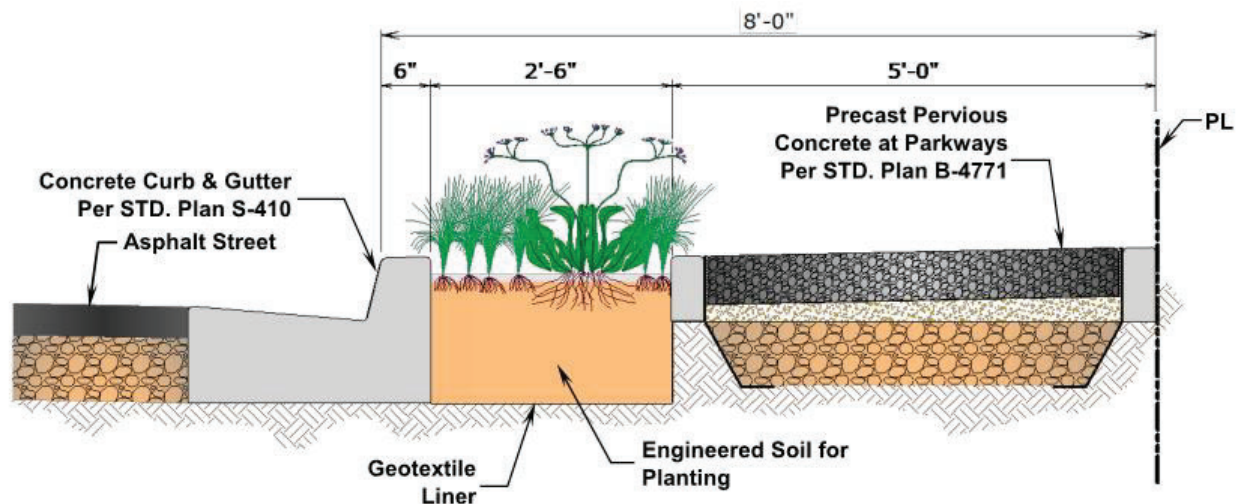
Typical Border Selection Showing infiltration planter and pervious concrete sidewalk
